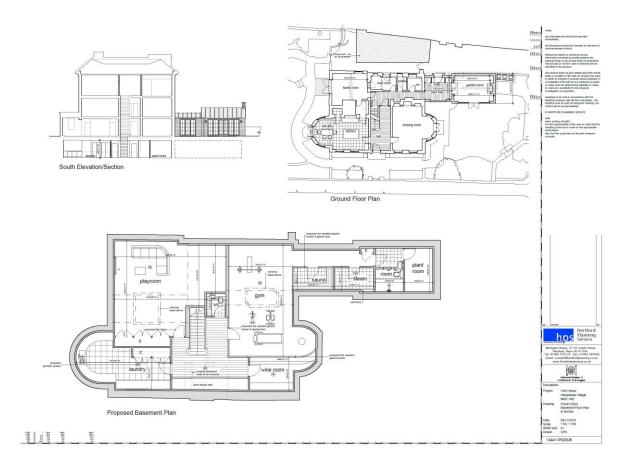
Floor plans and sectional elevation of proposed changes to Vine House
